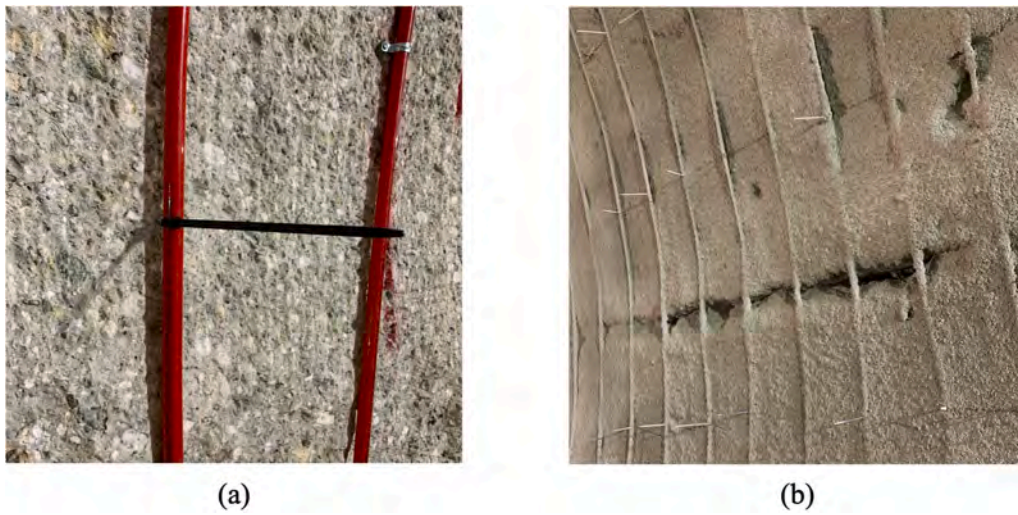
Pipe equipped with plastic cable clips: view of the coil a) before and b) after spraying the regularisation layer.
